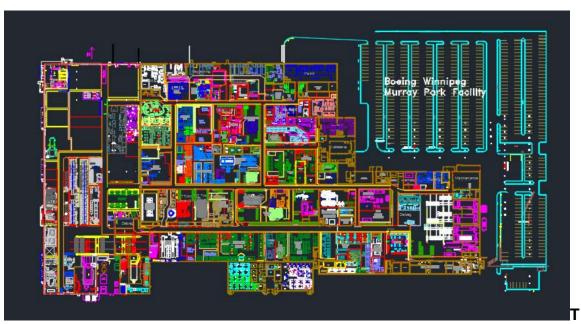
Location of New 737MAX Paint Booth, Flash-off and Cure Rooms at 99 Murray Park Road
